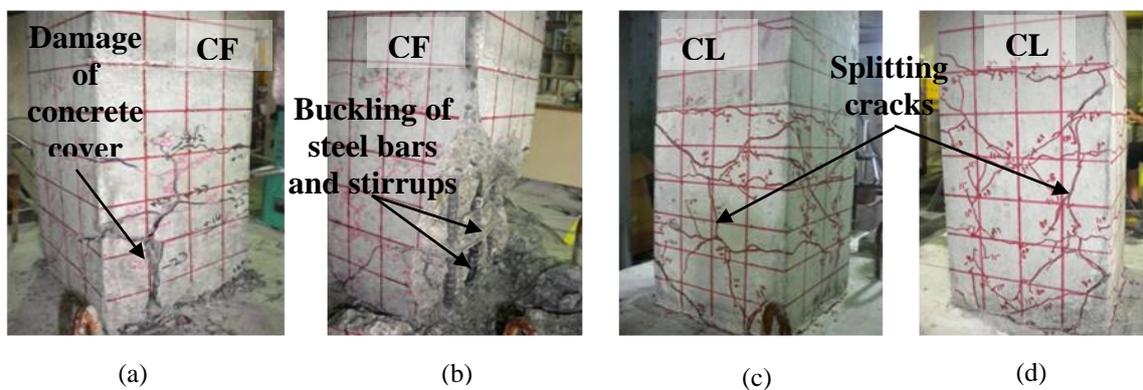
Final failure pattern of (a & b) CF column and (c & d) CL column
